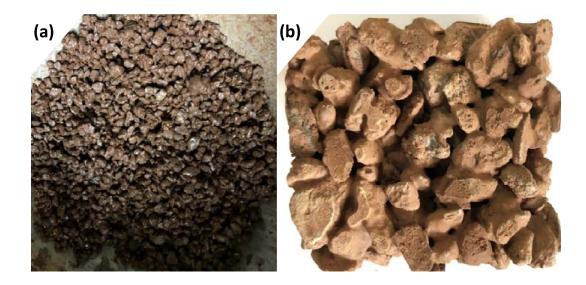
(a) In-situ mixing of pervious concrete, and (b) the hardened cubic specimens.
